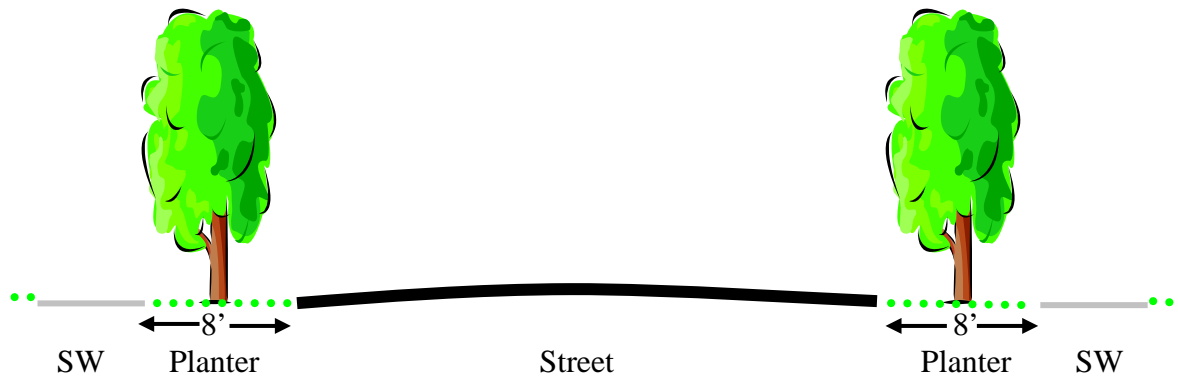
When space does not allow development of a full median, providing 8' planter strips will allow development of large, canopy forming trees. Planter strips should not be less than 6' wide. These narrow widths will only allow planting of small to medium sized trees that will not produce the canopy effect.
